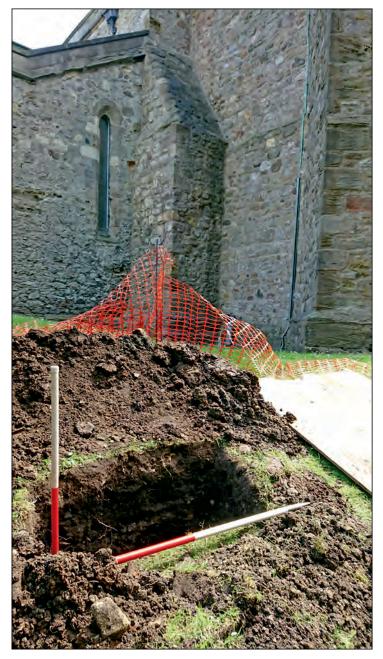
Broad view looking west, showing the first excavation attempt to find Mh1 (MH1a).
